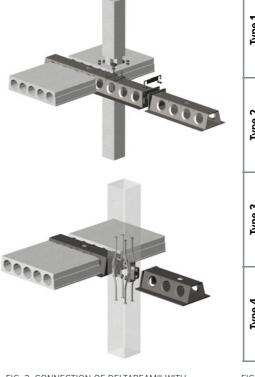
CONNECTION OF DELTABEAM® WITH CONCRETE COLUMNS
